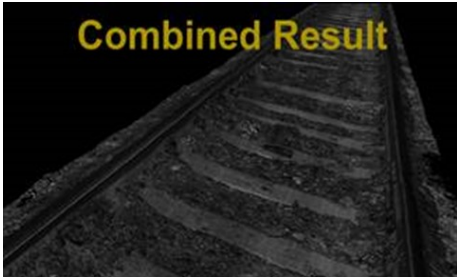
3D rendering of railroad track (courtesy of Pavemetrics)
